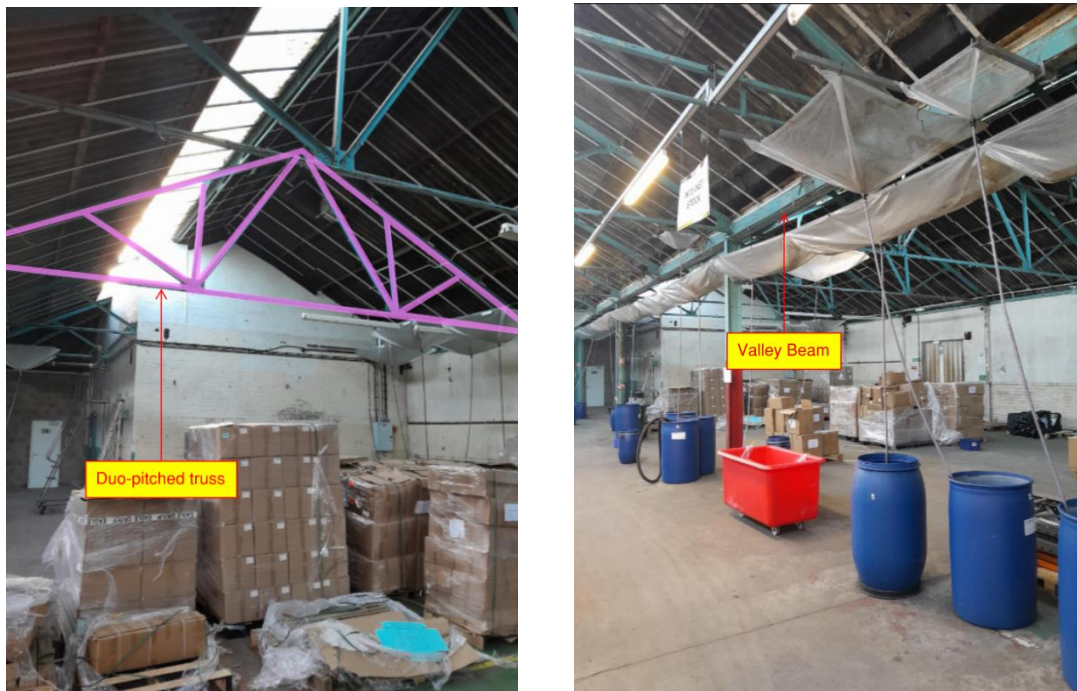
& Figure 1.4 – Zone 'A' retained, Duo-pitched truss and valley beam, roof construction
